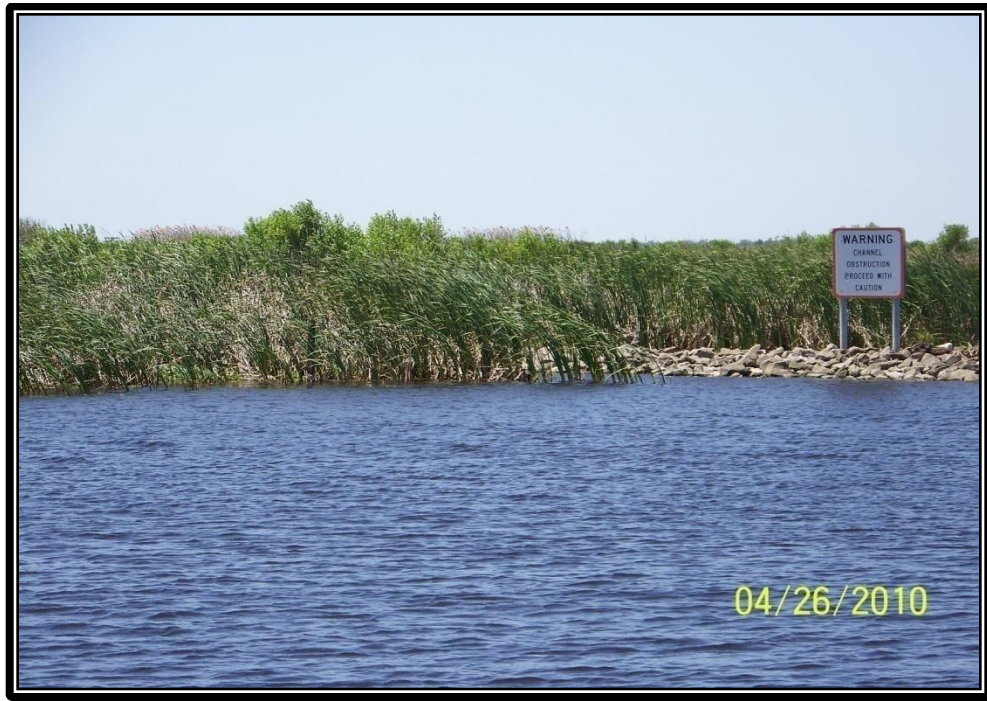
view of southeast bank tie-in of the rock weir (Structure No.2).
